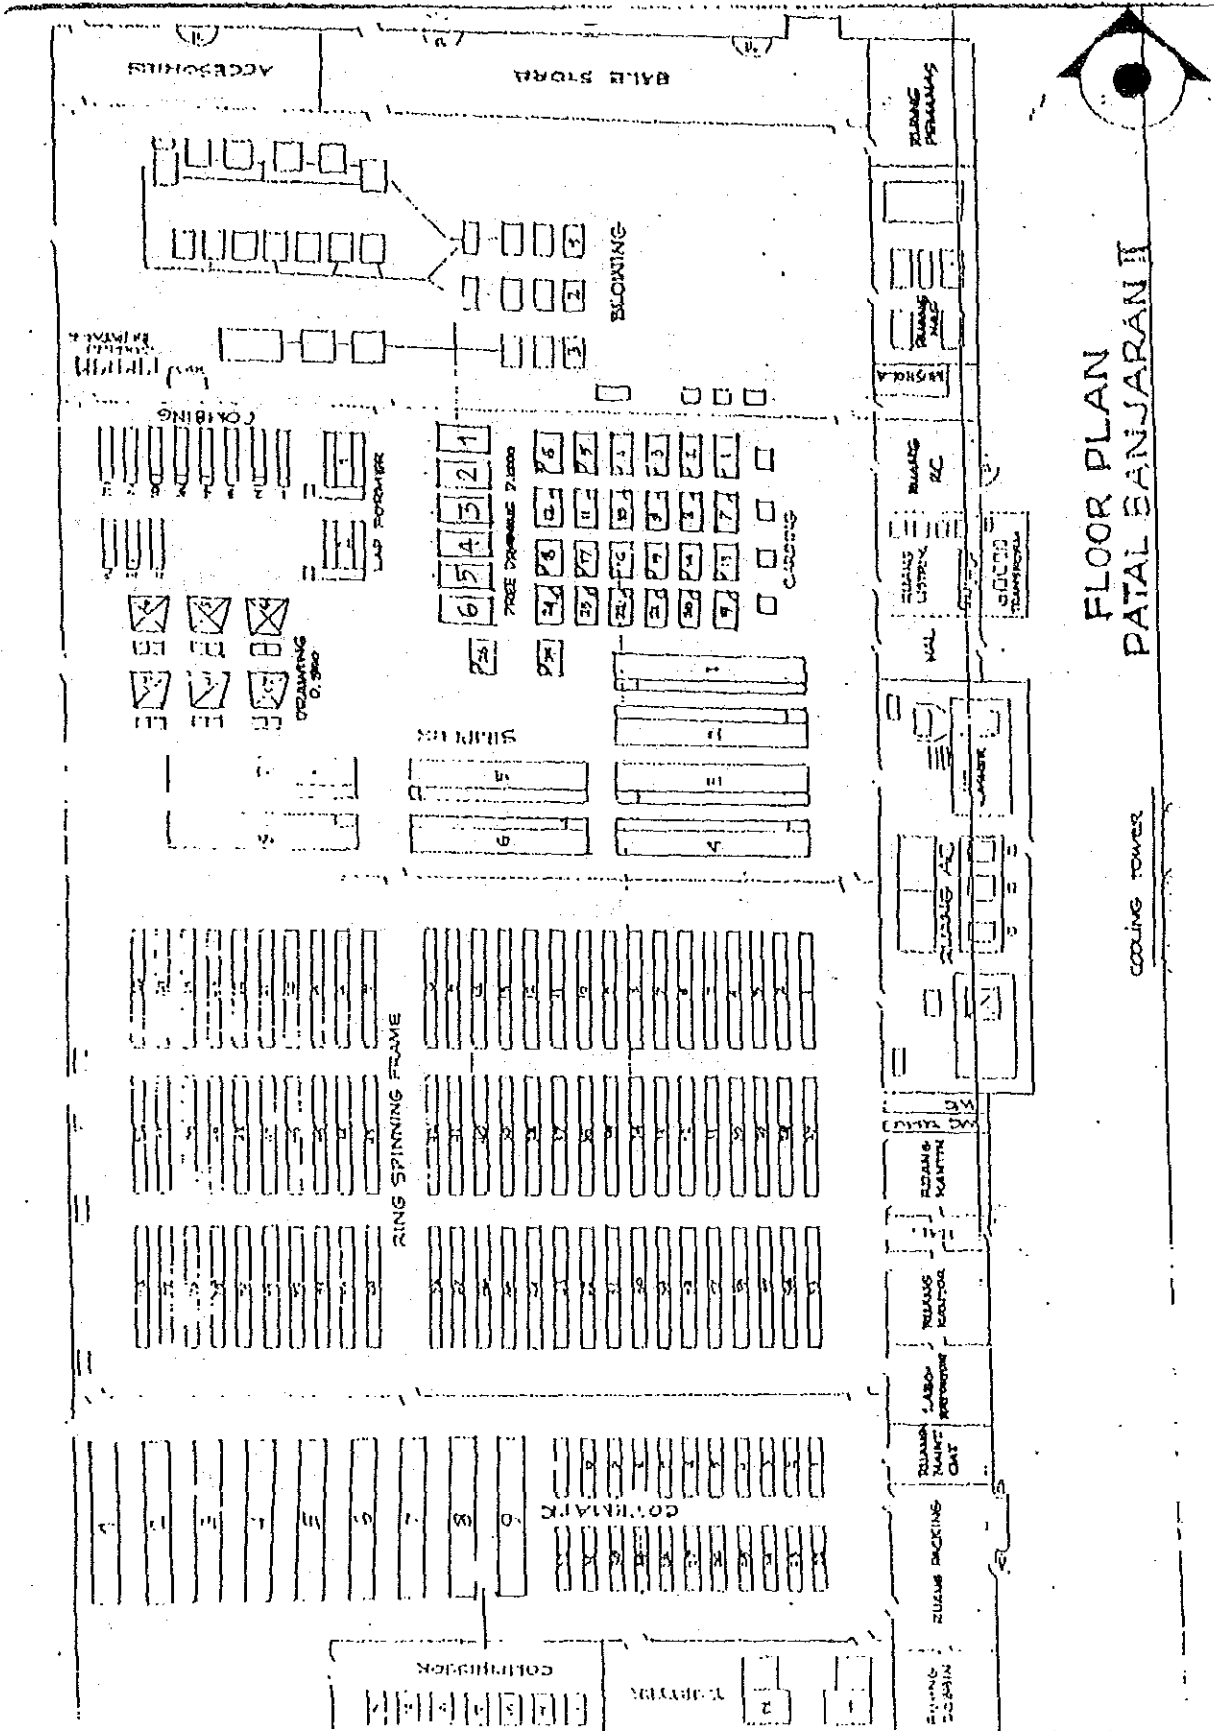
LAYOUT FOR MACHINERY OF EXISTING PLANT
